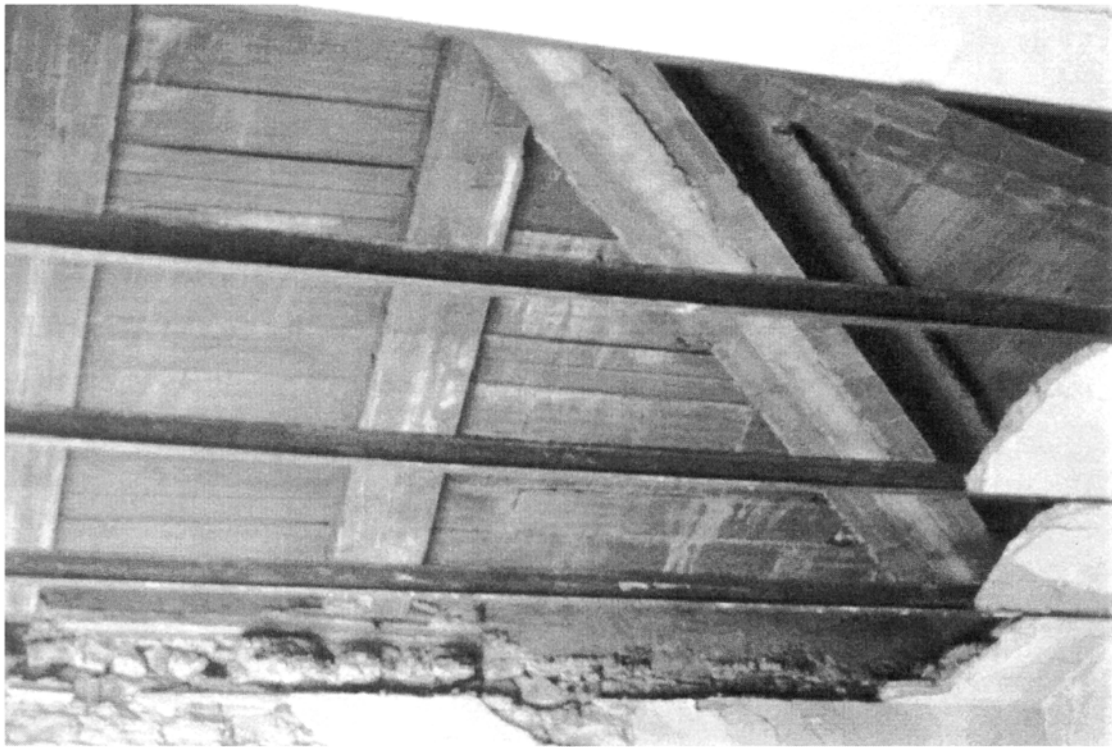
Santa Chiara Convent: collapse of the false ceiling and the roof structure at the southwestern corner
